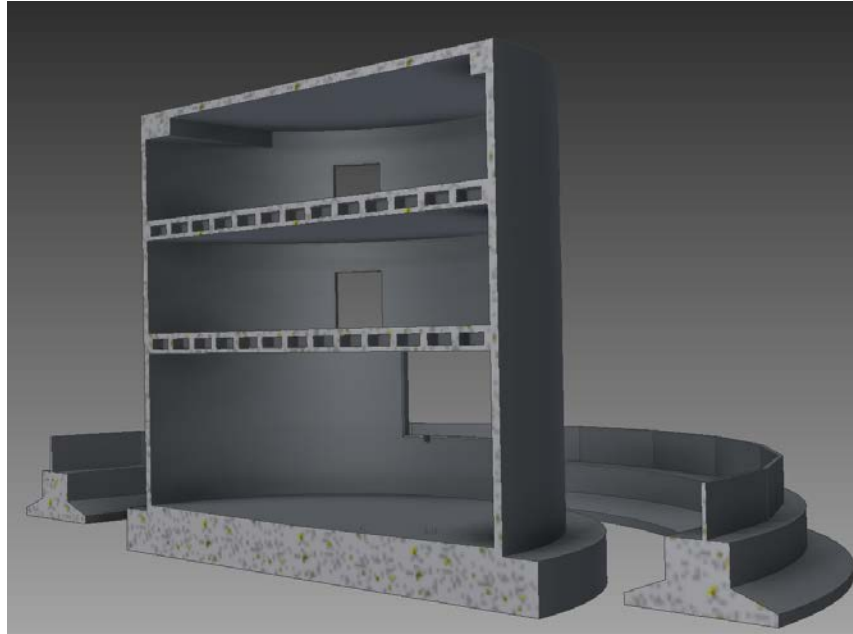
Image showing a half section view of the inner concrete telescope pier and outer building ring foundation
